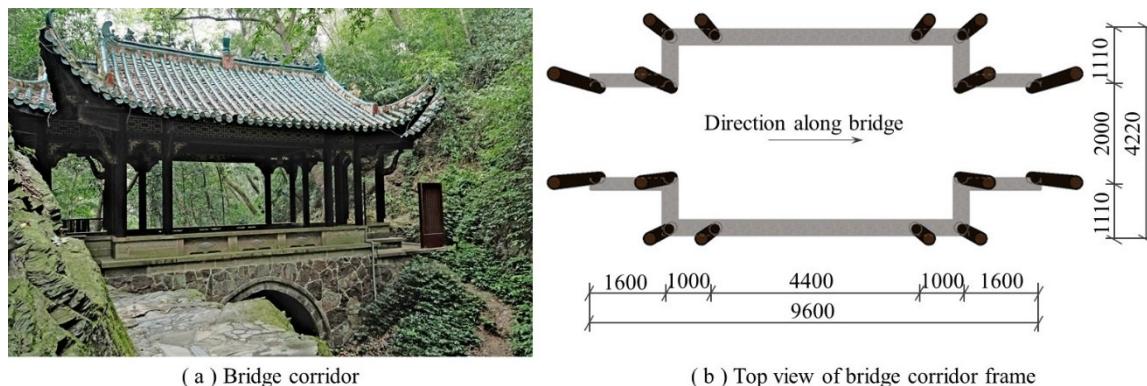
Dimension of bridge corridor constructed later (unit: mm)
